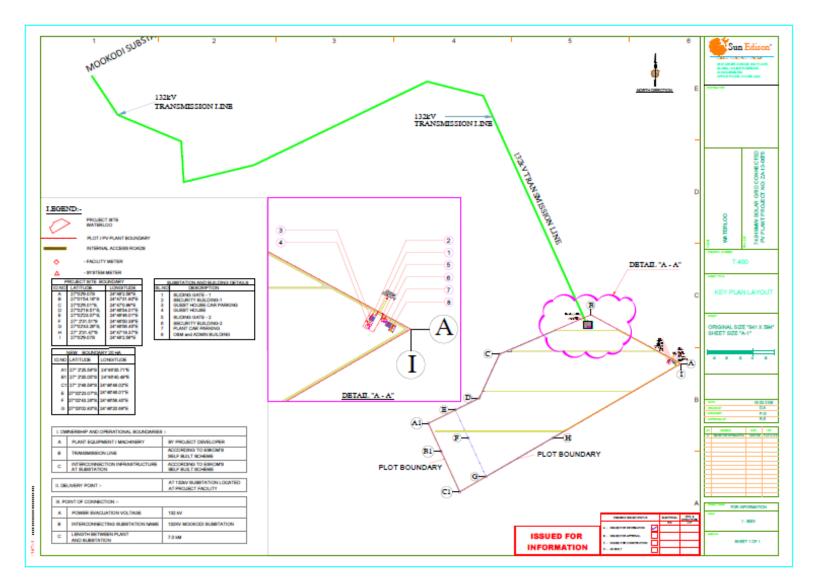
Layout plan indicating site boundary, plant boundary and internal roads.
